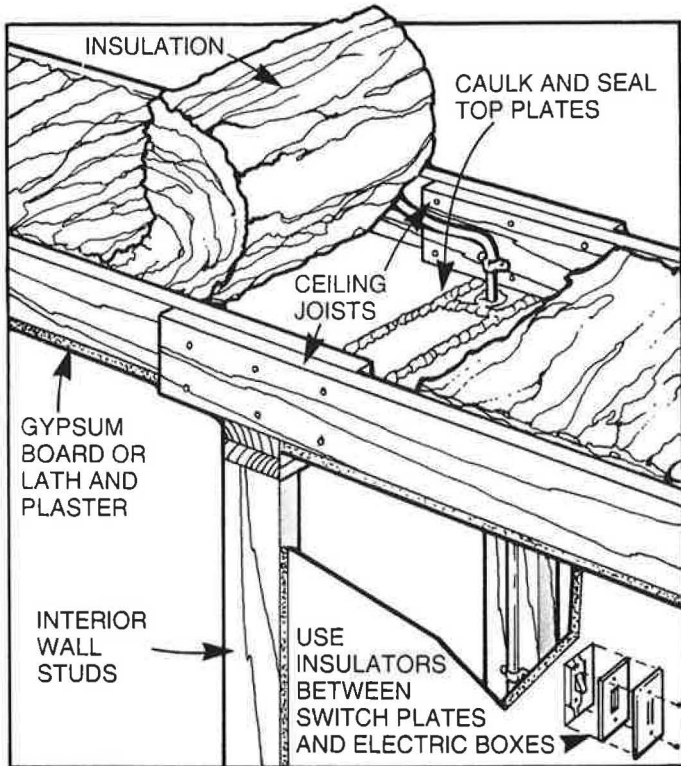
In creating the air-barrier system it is important to seal electrical boxes and insulate switch plates and to caulk and seal top plates of partition walls. For greater detail on techniques used to make an air-barrier system via the Airtight Drywall Approach (ADA), see the Iowa DNR (1987) and Lstiburek (1987a) references.
